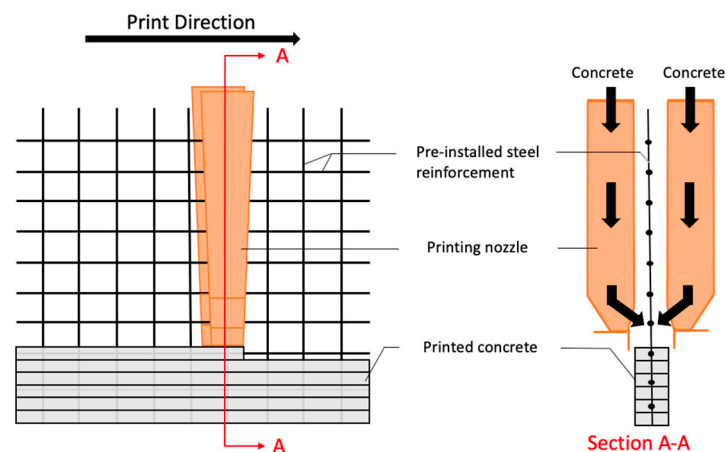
Concrete printing with vertical and horizontal reinforcement by HuaShang Tengda Ltd.
